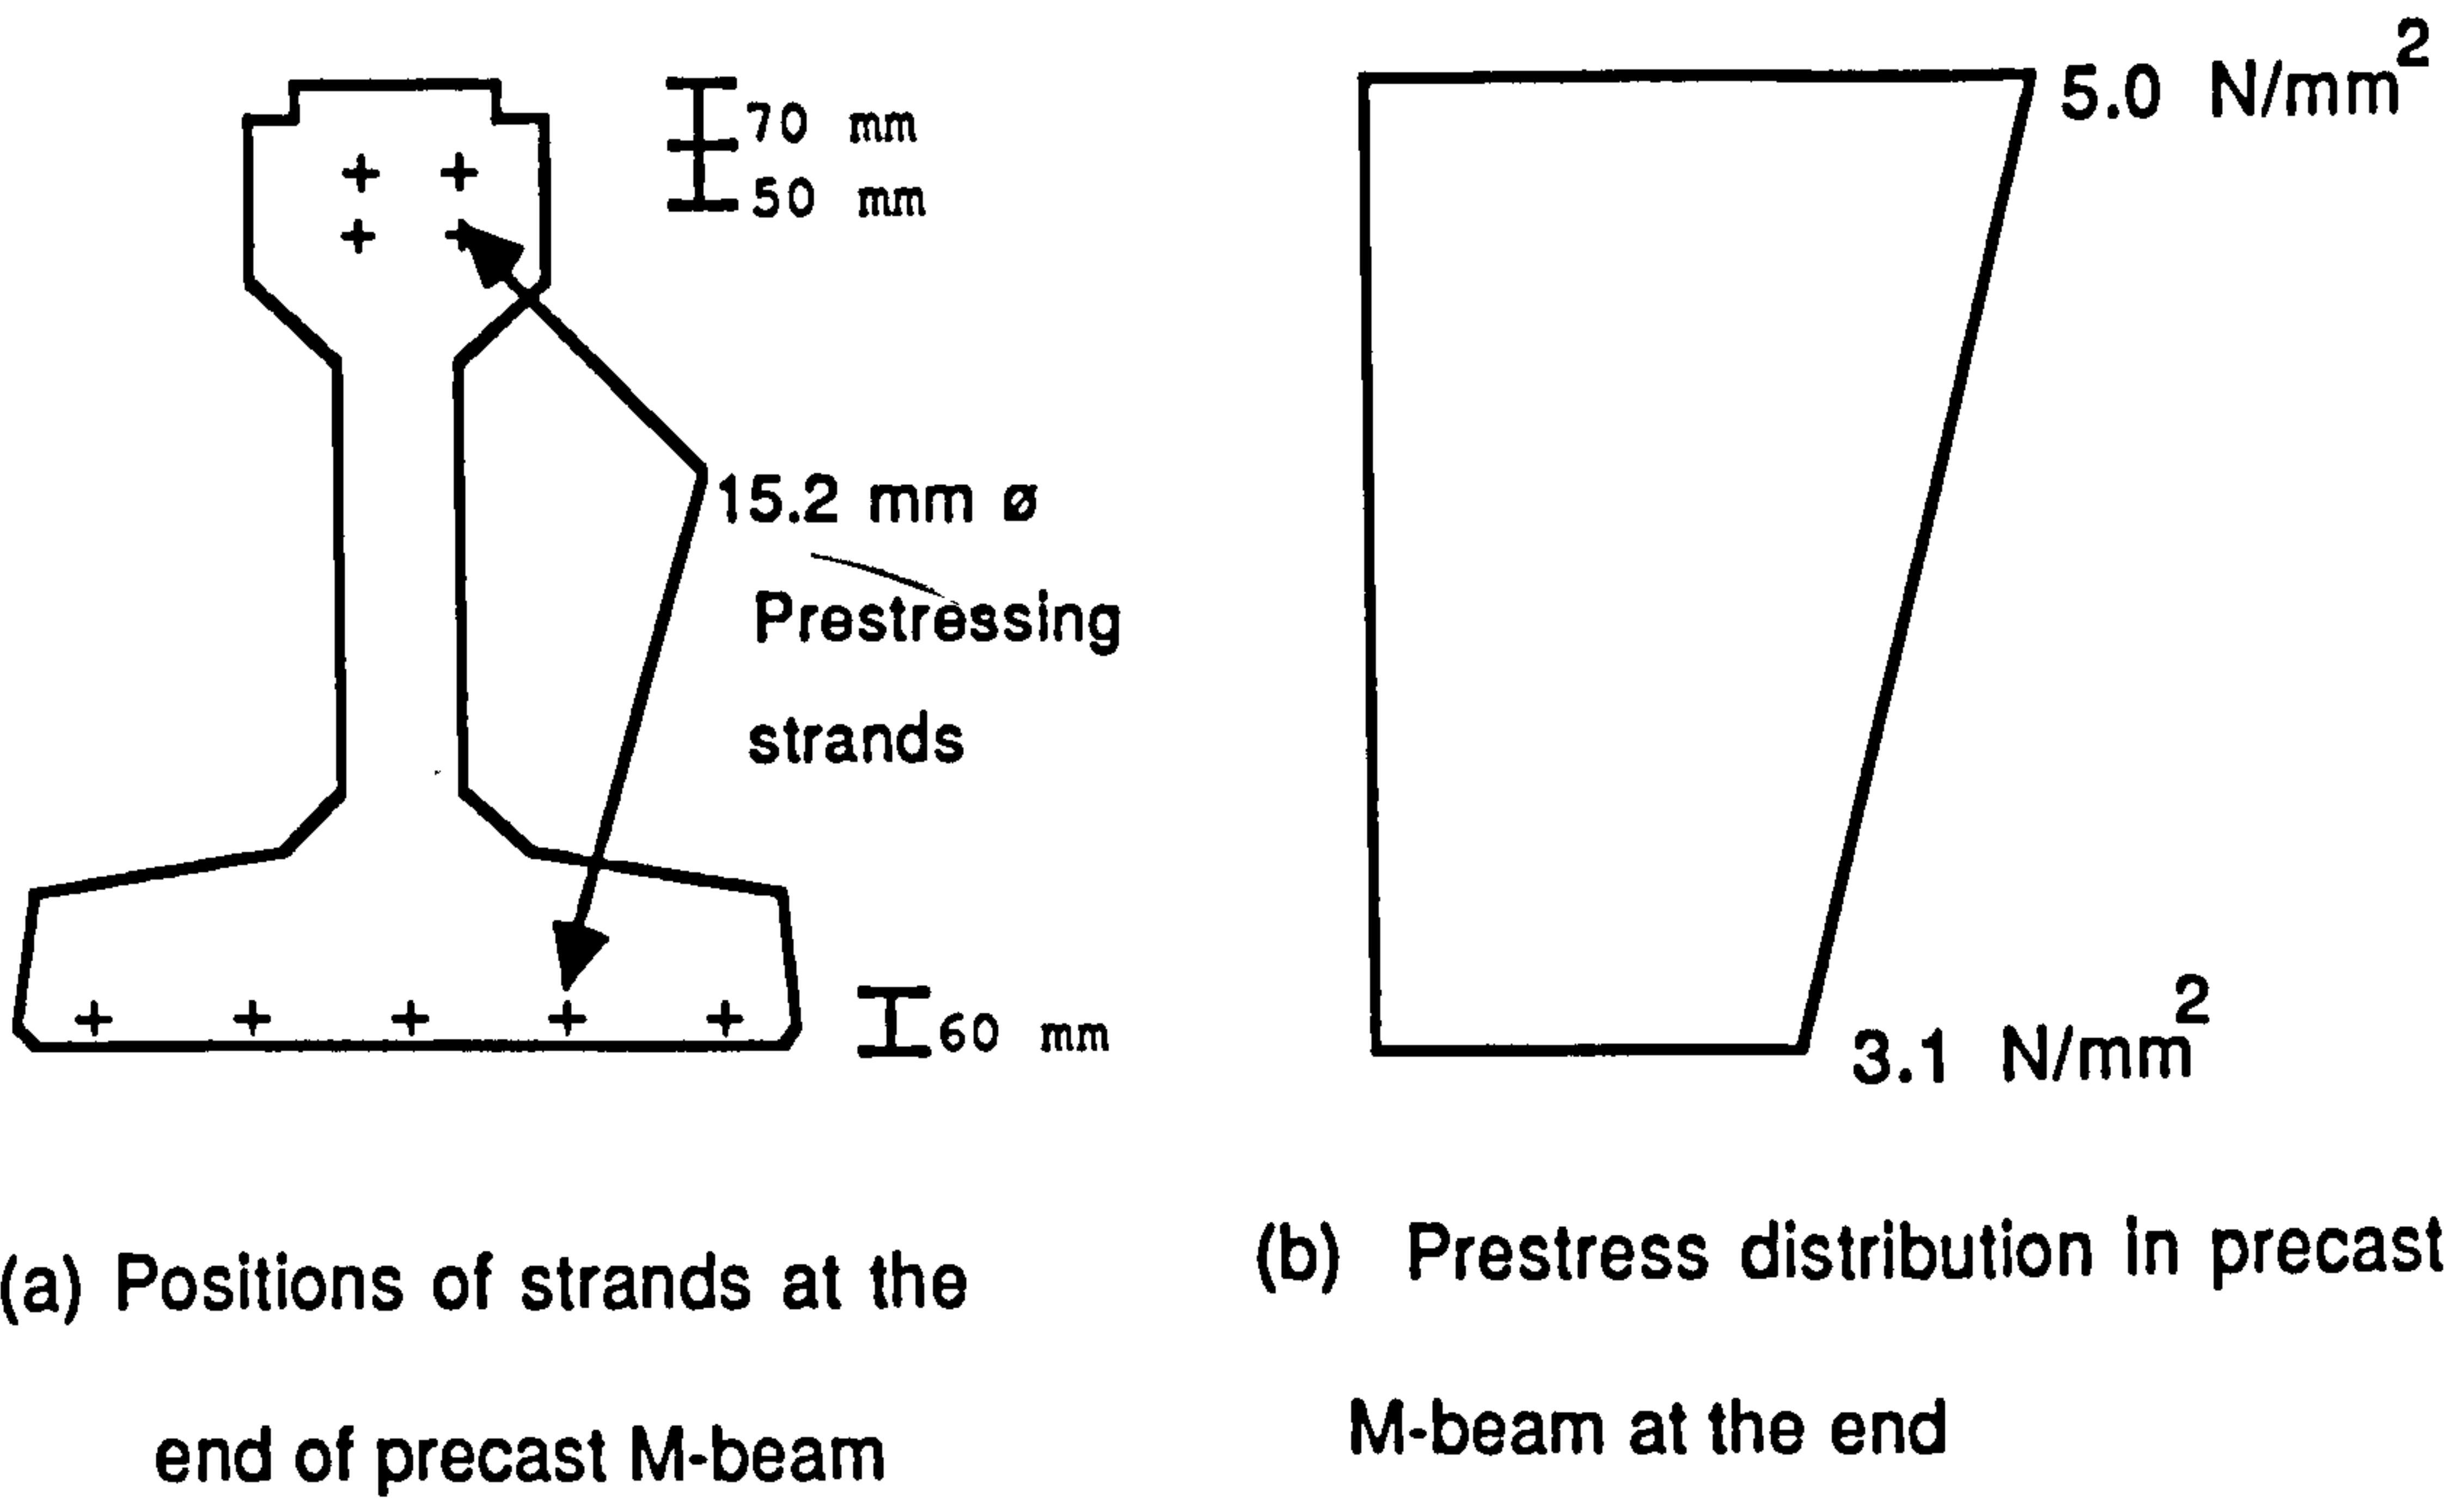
Prestress in Precast M-Beams at the Interior Support
